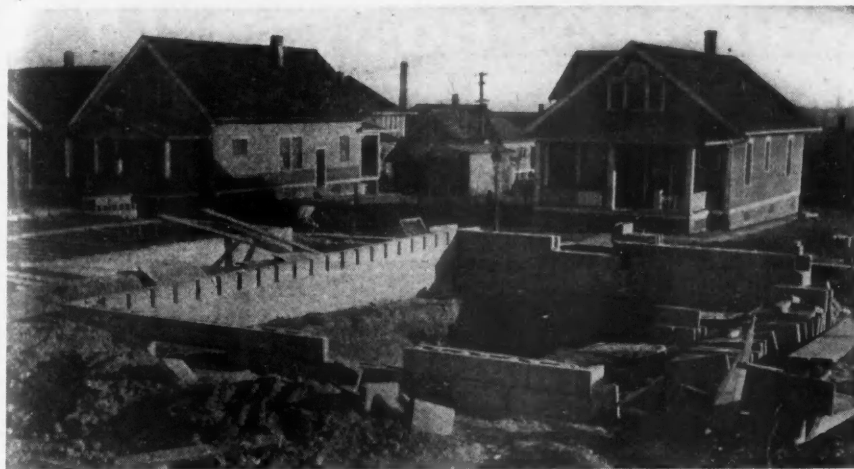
House Shown in Fig. 1 at an Earlier Stage in Its Construction. The Single Houses Contain About 2,300 Double Block, and the Walls Are Laid Up in Three to Four Days. The First House Was Started December 1, and Two or Three Houses Have Been Started Every Week Since.
